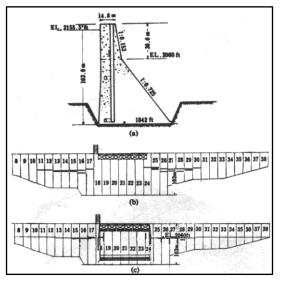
Cracking of Koyna concrete gravity dam during December 11, 1967 earthquake
